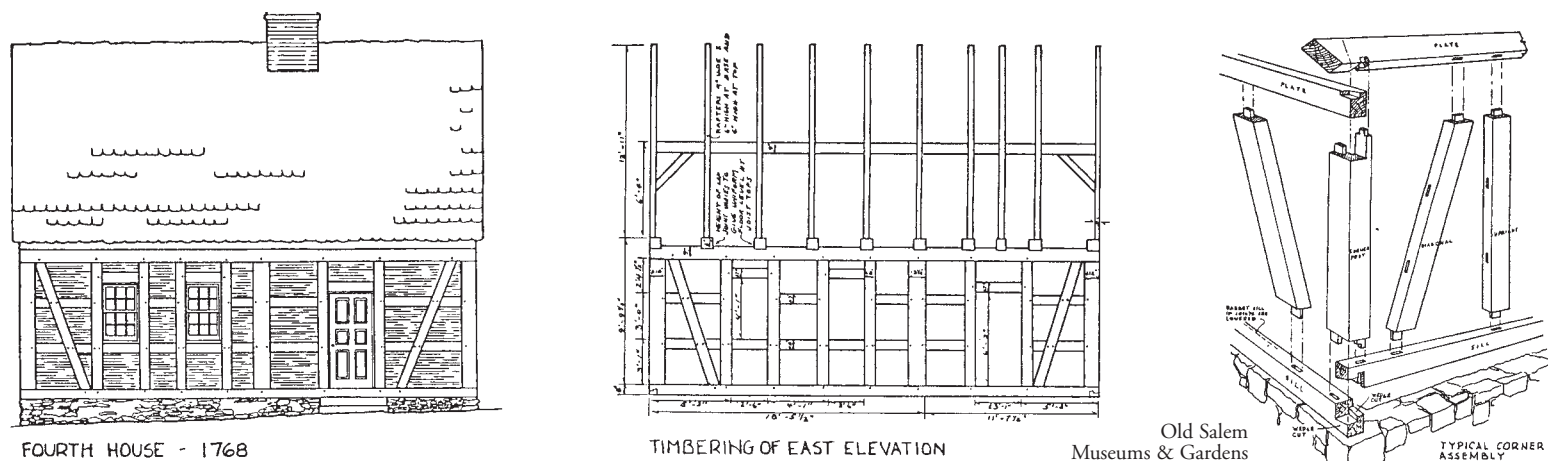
Framing details of typical Salem Fachwerk house. European-style wall braces, direction reversed in the exploded view, rise from sill to plate. All rafter pairs are base-tied. Corner posts, hewn out on the interior for plaster corners, tenon to plate and tie at top, both sills at bottom.
